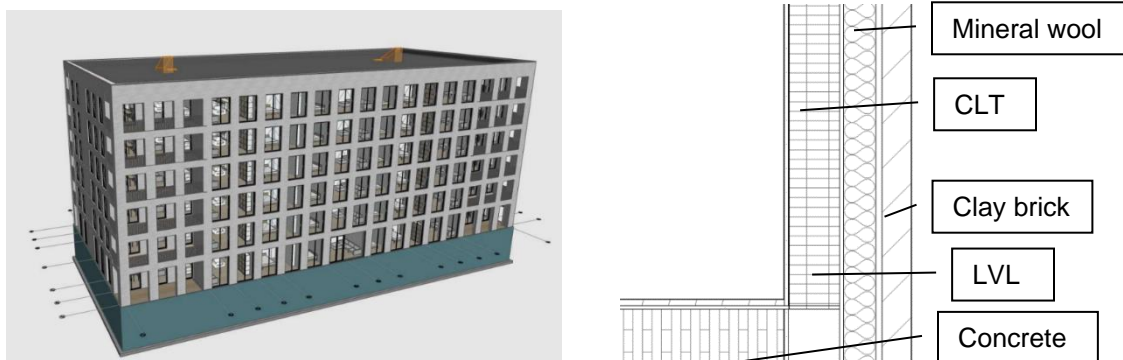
3D section view of the referenced residential building used for this study and exterior wall section
